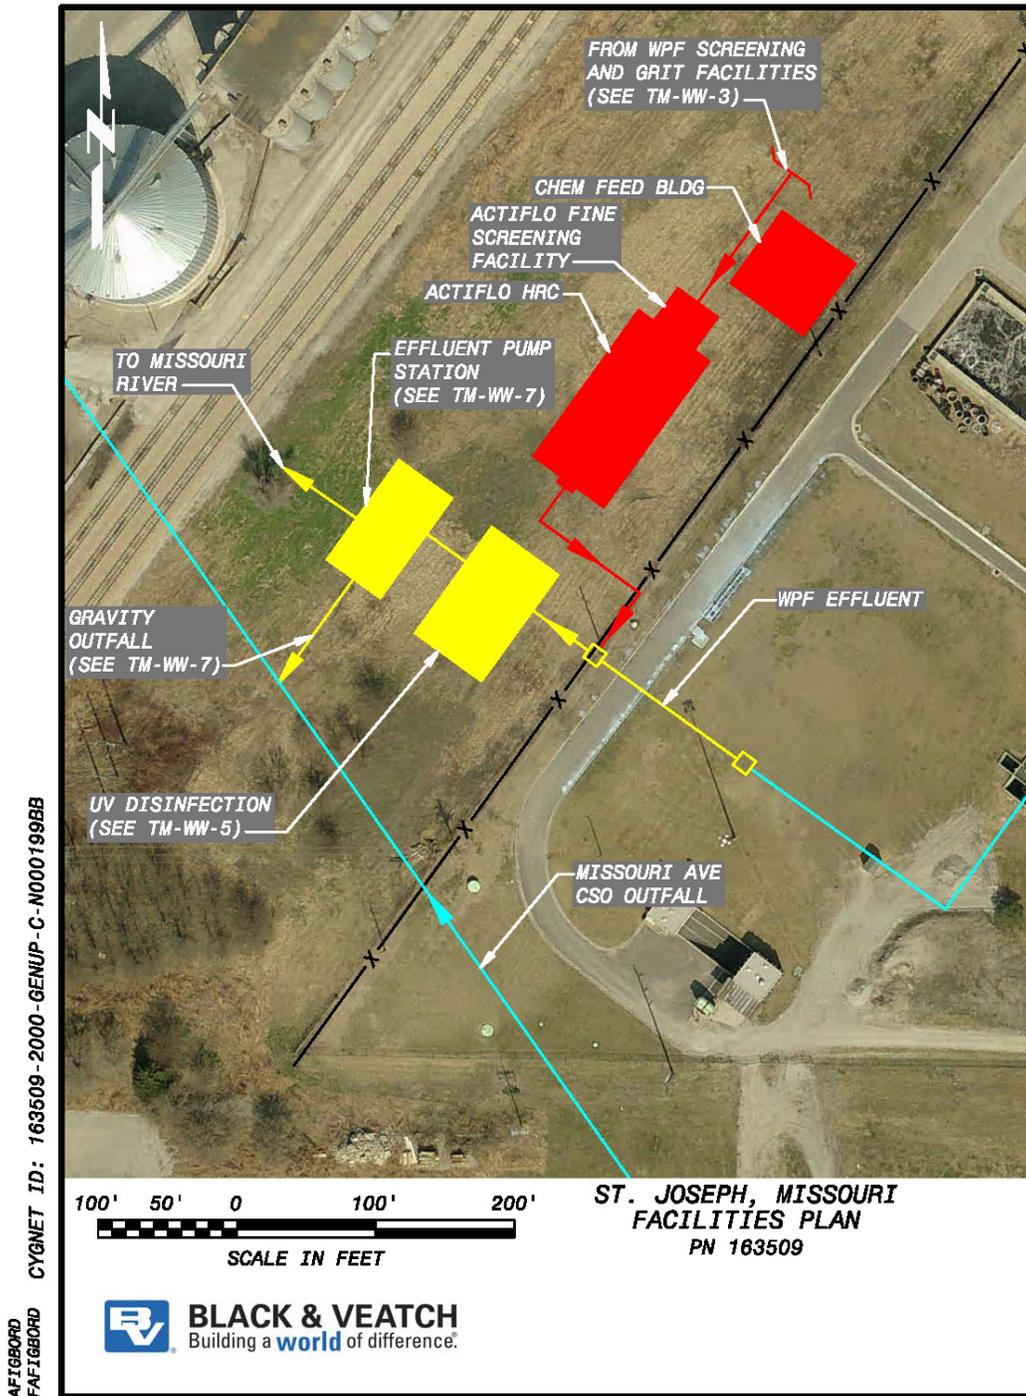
Preliminary Site Layout for Alternative 1A: HRC Ballasted Flocculation
